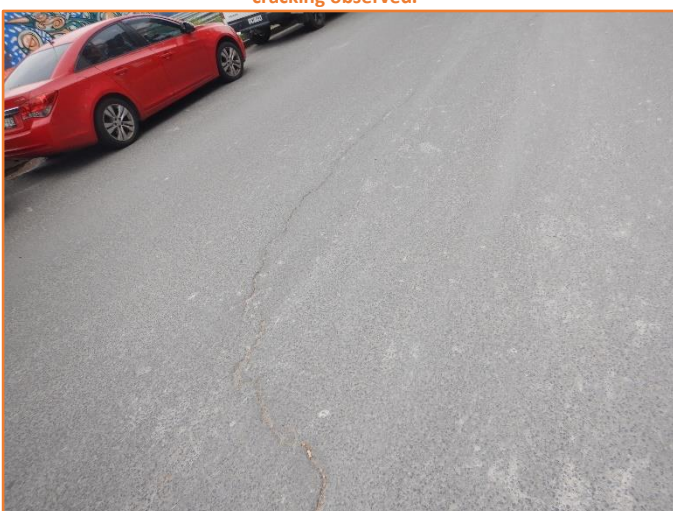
Reasonable - General condition of flexible pavement. Minor cracking observed.
